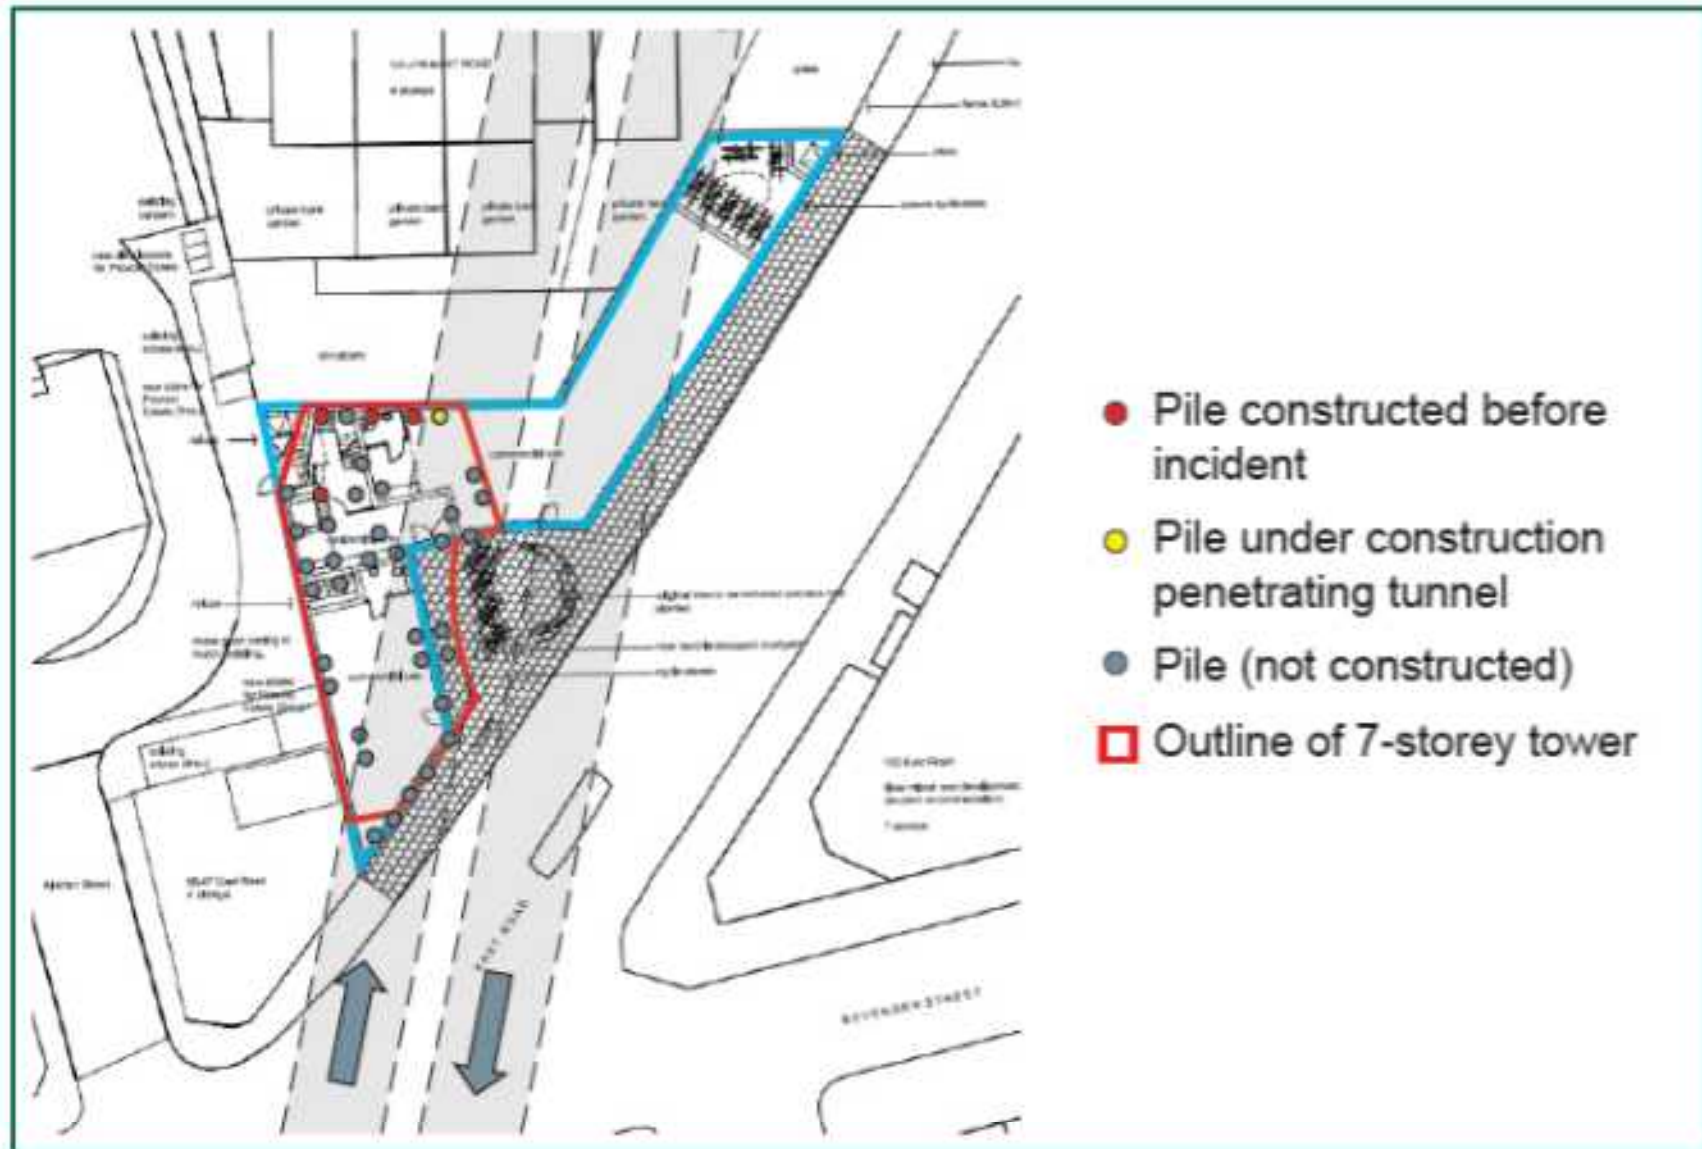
Extract from 2011 planning application enhanced to show location of piles and tunnels
